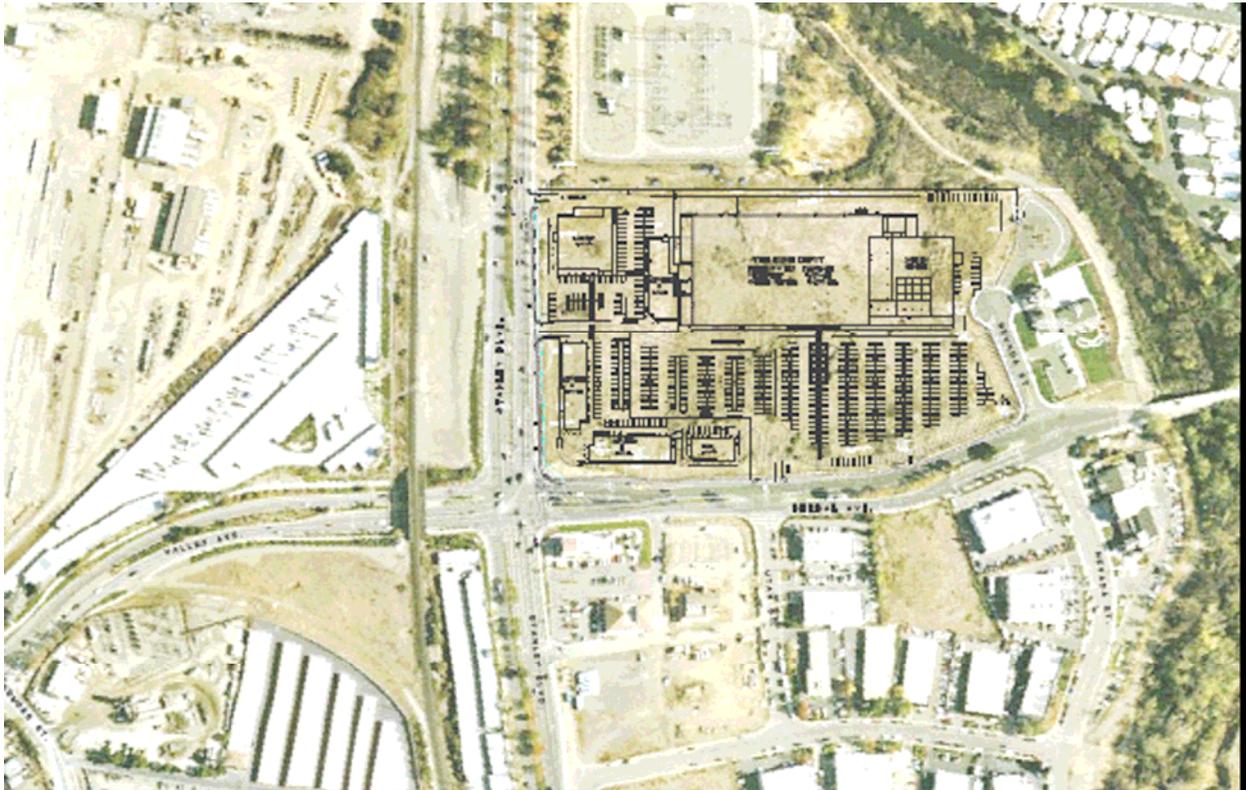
Project Site and the Stanley Boulevard/Valley Avenue/Bernal Avenue Intersection.
